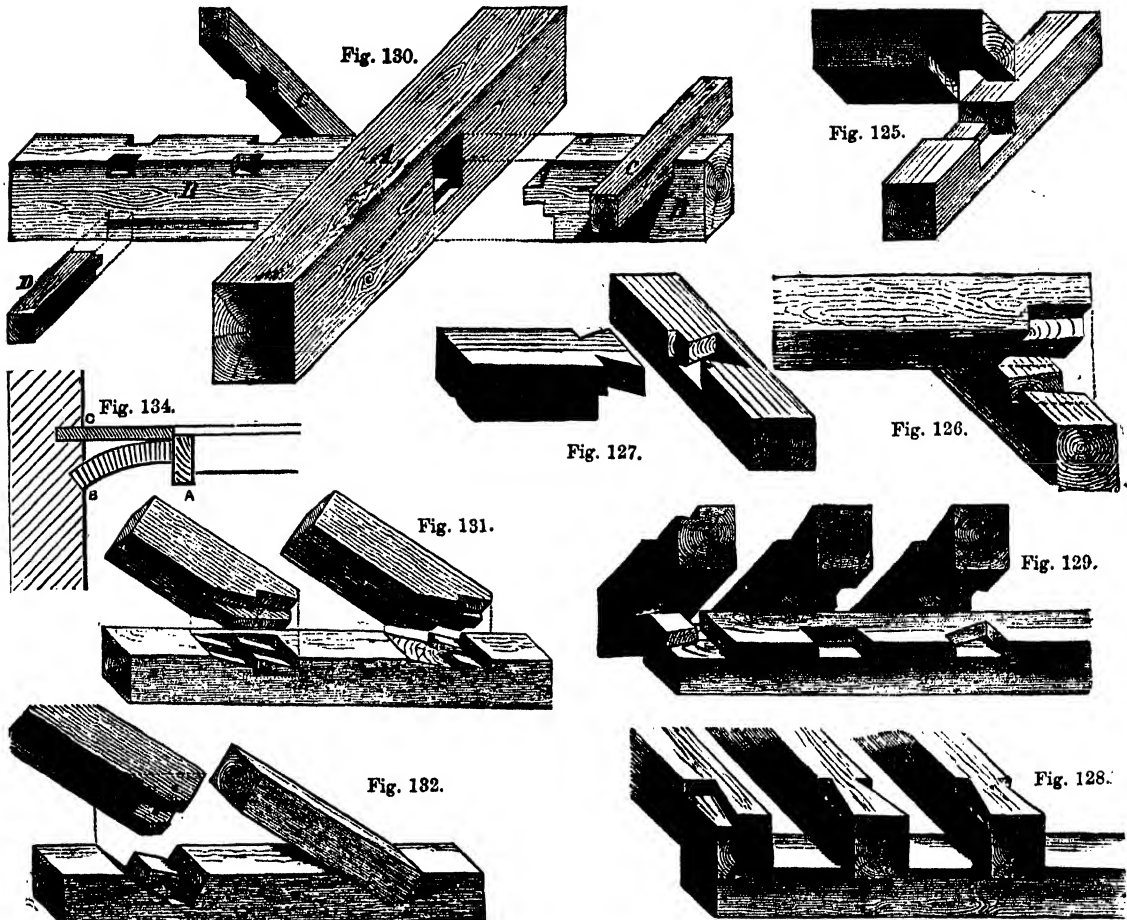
is a joint of a similar character, a dovetail being employed in this case, which in Fig. 127 is further secured by an additional shoulder.
